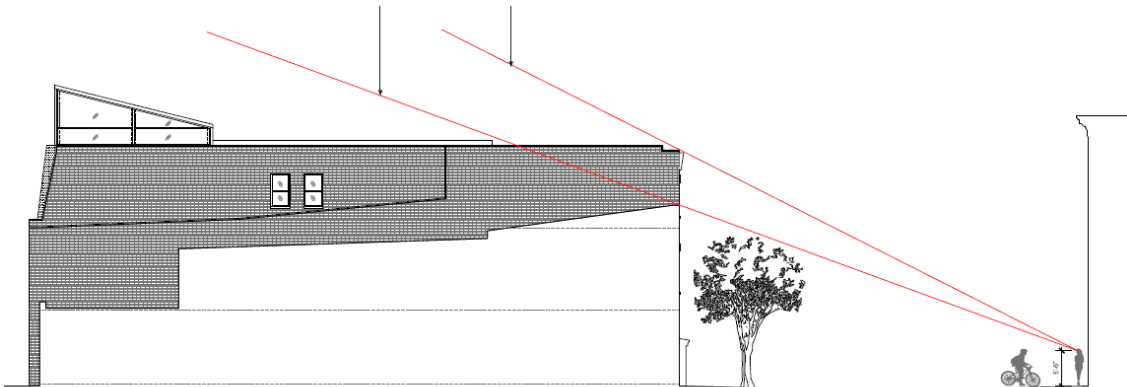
CURRENT DESIGN showing potential site lines and revised/reduced skylight, showing west elevation.
